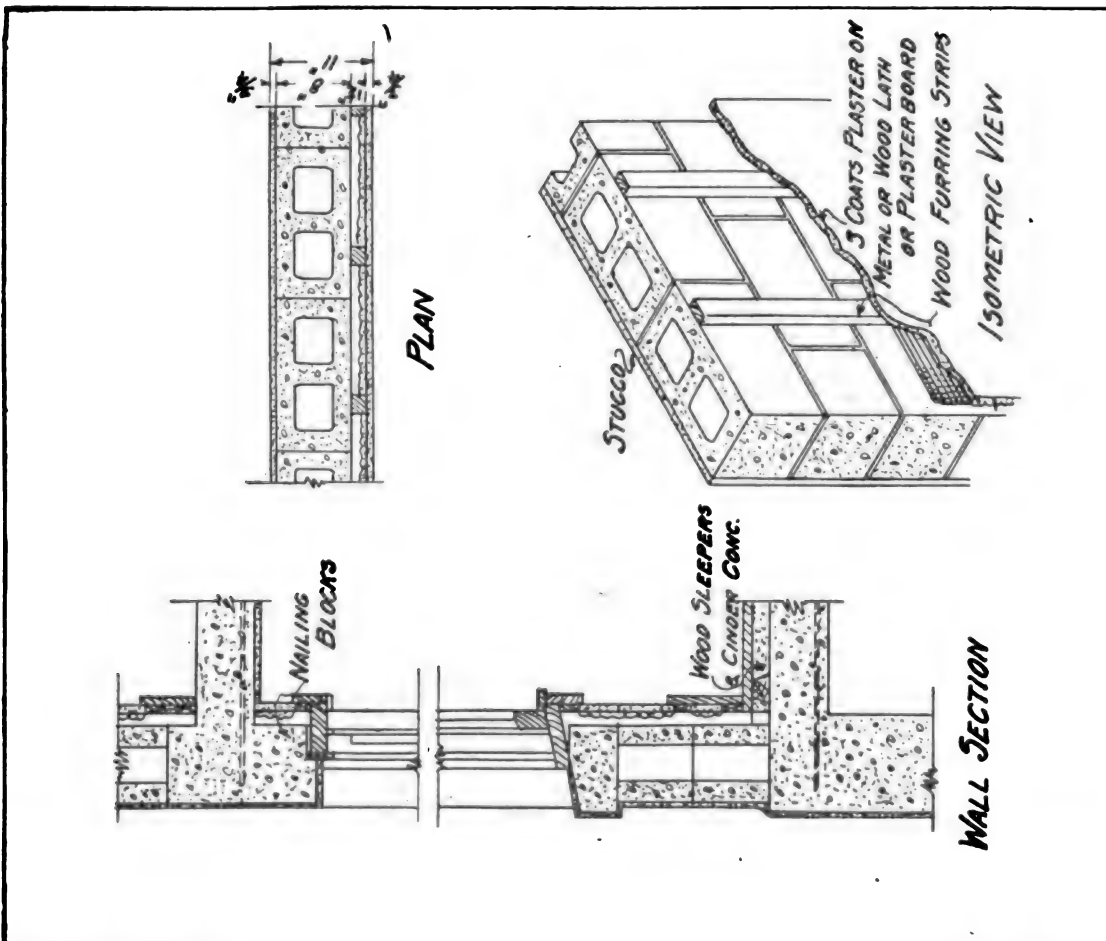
DETAIL OF HOUSE CONSTRUCTION WITH FIREPROOF CONCRETE FLOORS AND HOLLOW CONCRETE BLOCK OF CONVENTIONAL TYPE
